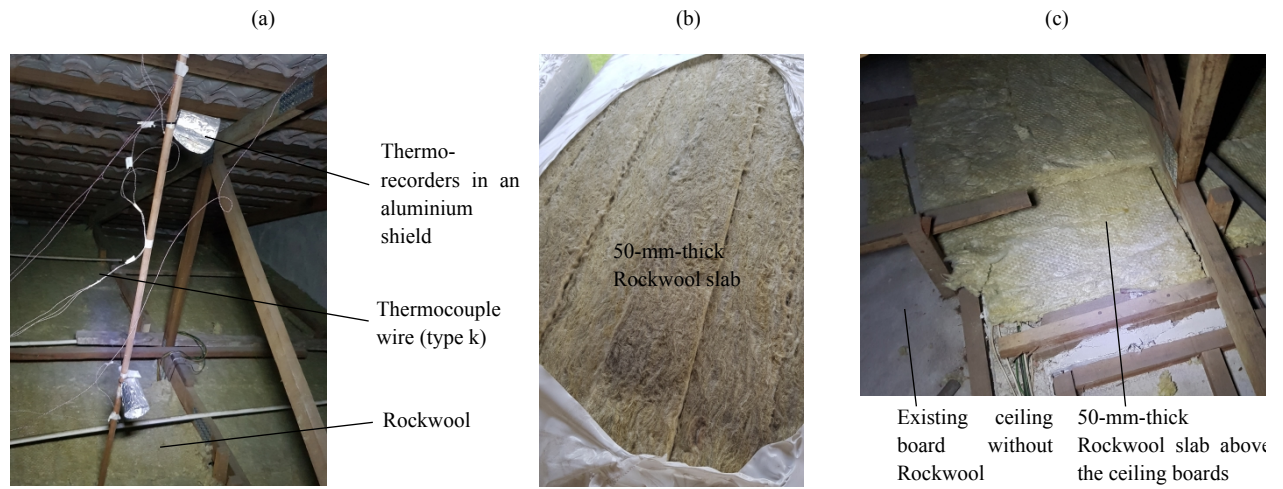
Installation of the Rockwool slab above the ceiling. (a) Setup of the measurement in the roof, (b) 50-mm-thick Rockwool slab, and (c) Rockwool slab installed above the ceiling boards.
